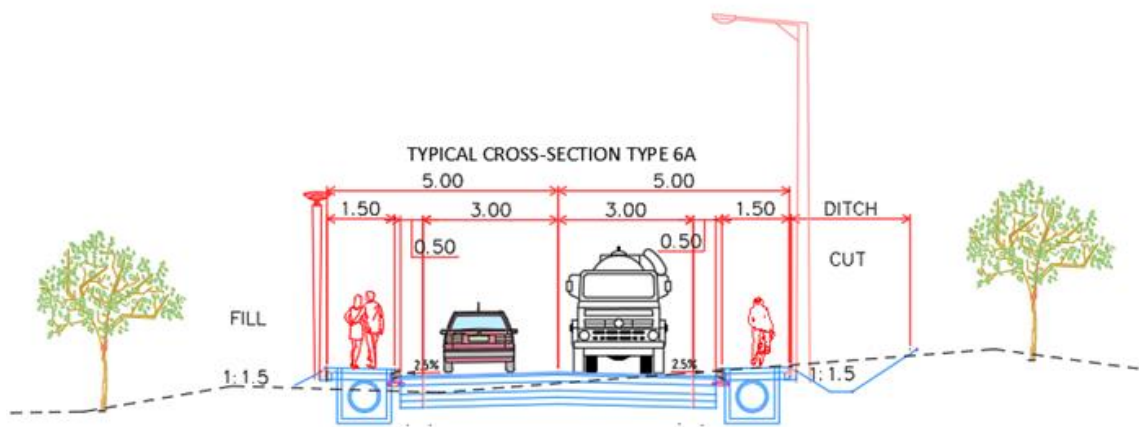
Typical cross sections Type 6A for Collector roads (Urban Area)
